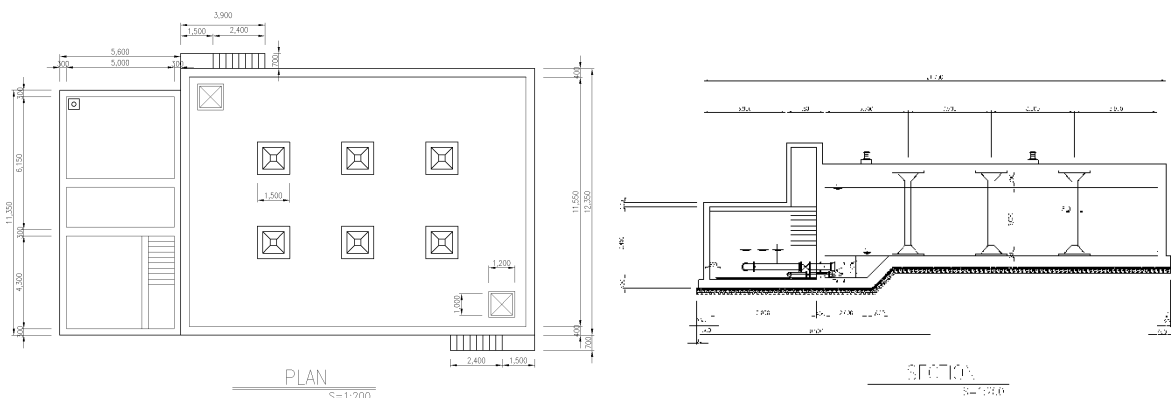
Plan and Section of New Reservoir (1,000 m³)
